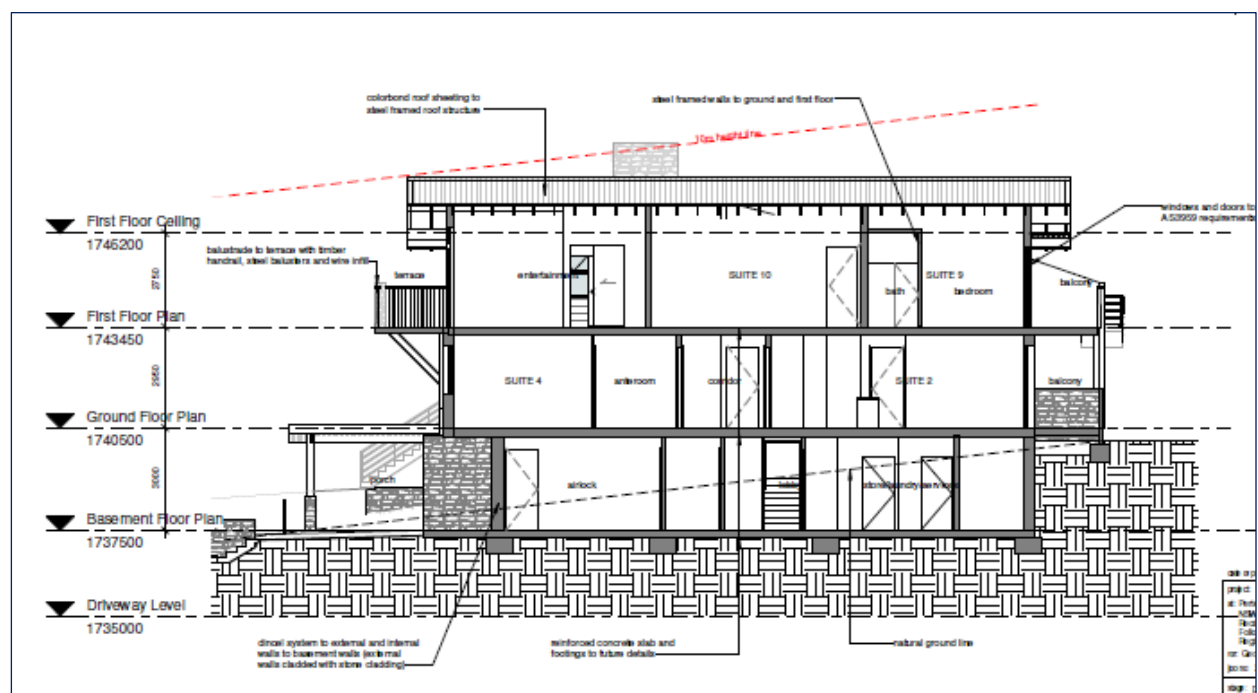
| Section drawing, 10 metre requirement illustrated (Source: Applicant's documentation)
